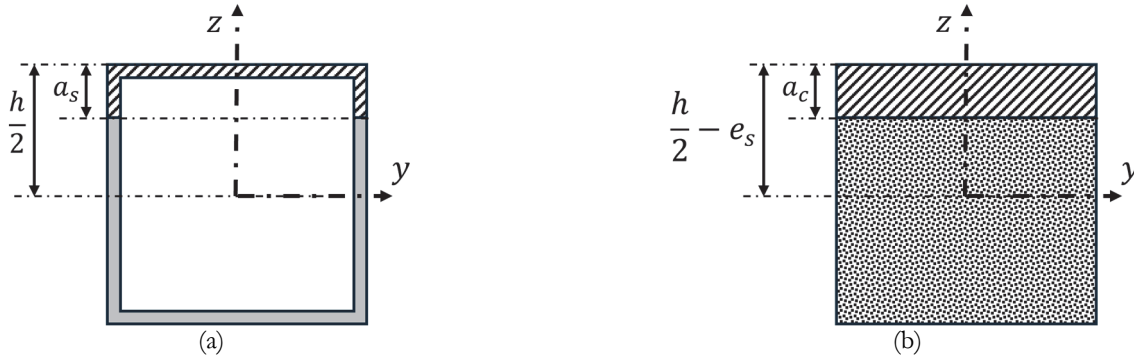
Cross section of the Cracked element. (a) (a_s crack depths of steel box layer), (b) (a_c crack depths composite polymer concrete core).
